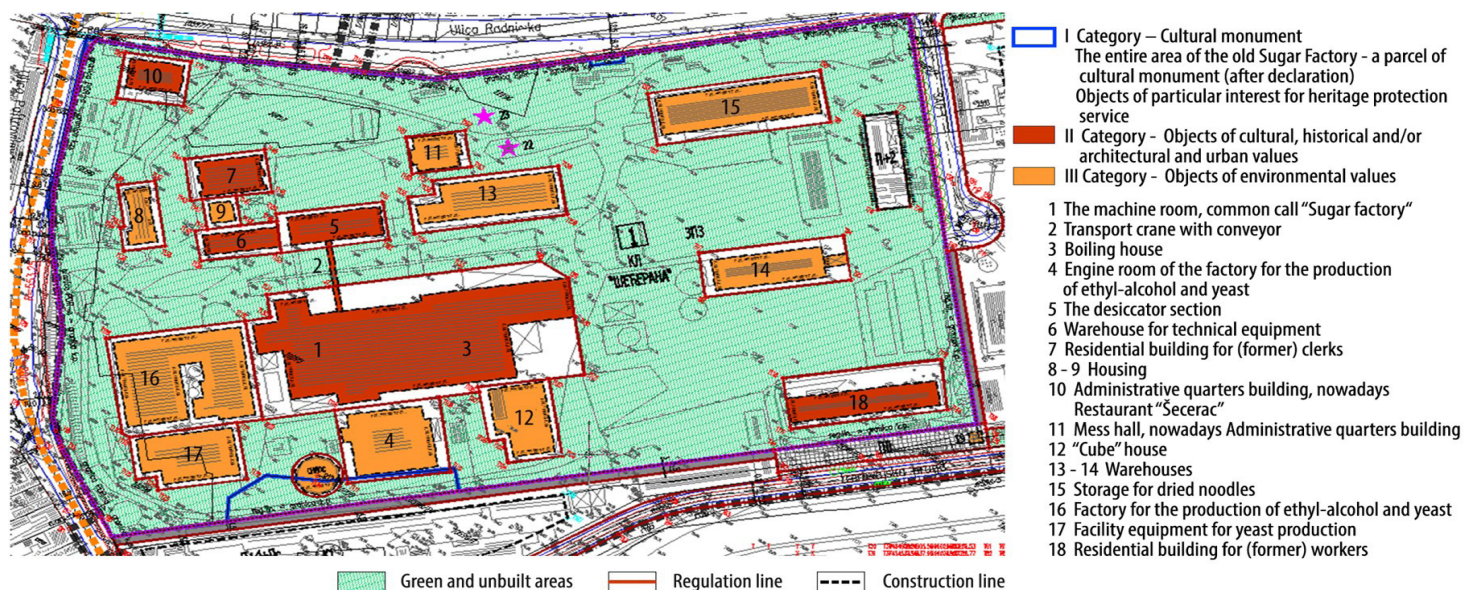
Sugar factory – Purpose plan area. Source: DRP no. 98/16.
